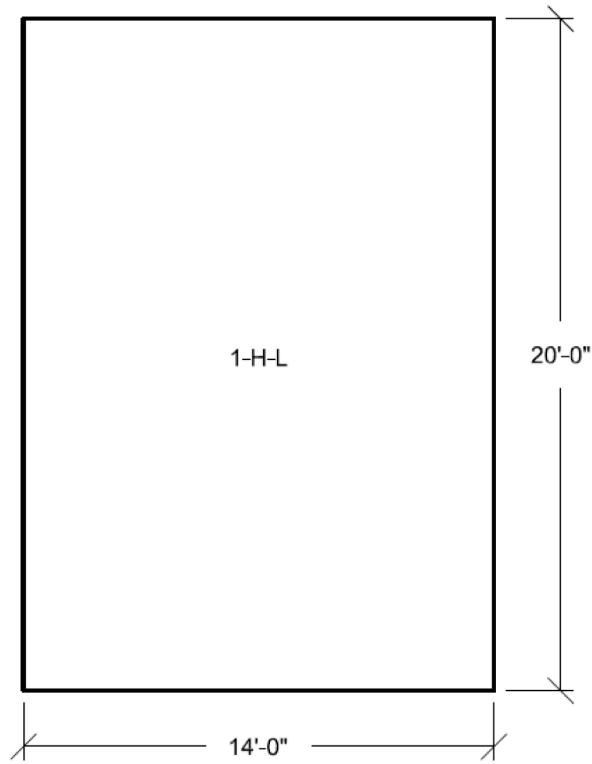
H.6-179 DGFO SV Wall 10 Looking From Outside Horizontal Reinforcement Zones Far Side Face
